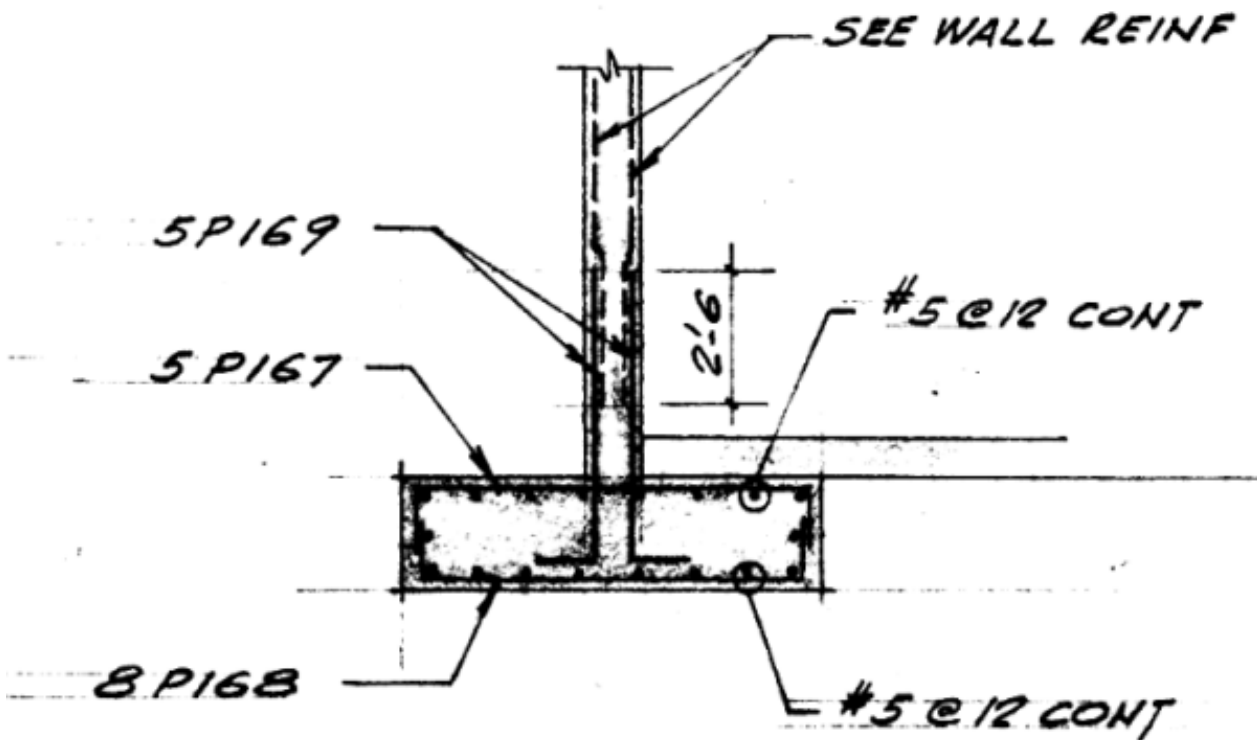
Foundation cross section and reinforcement detail (CFHT, 1974, with permission)
